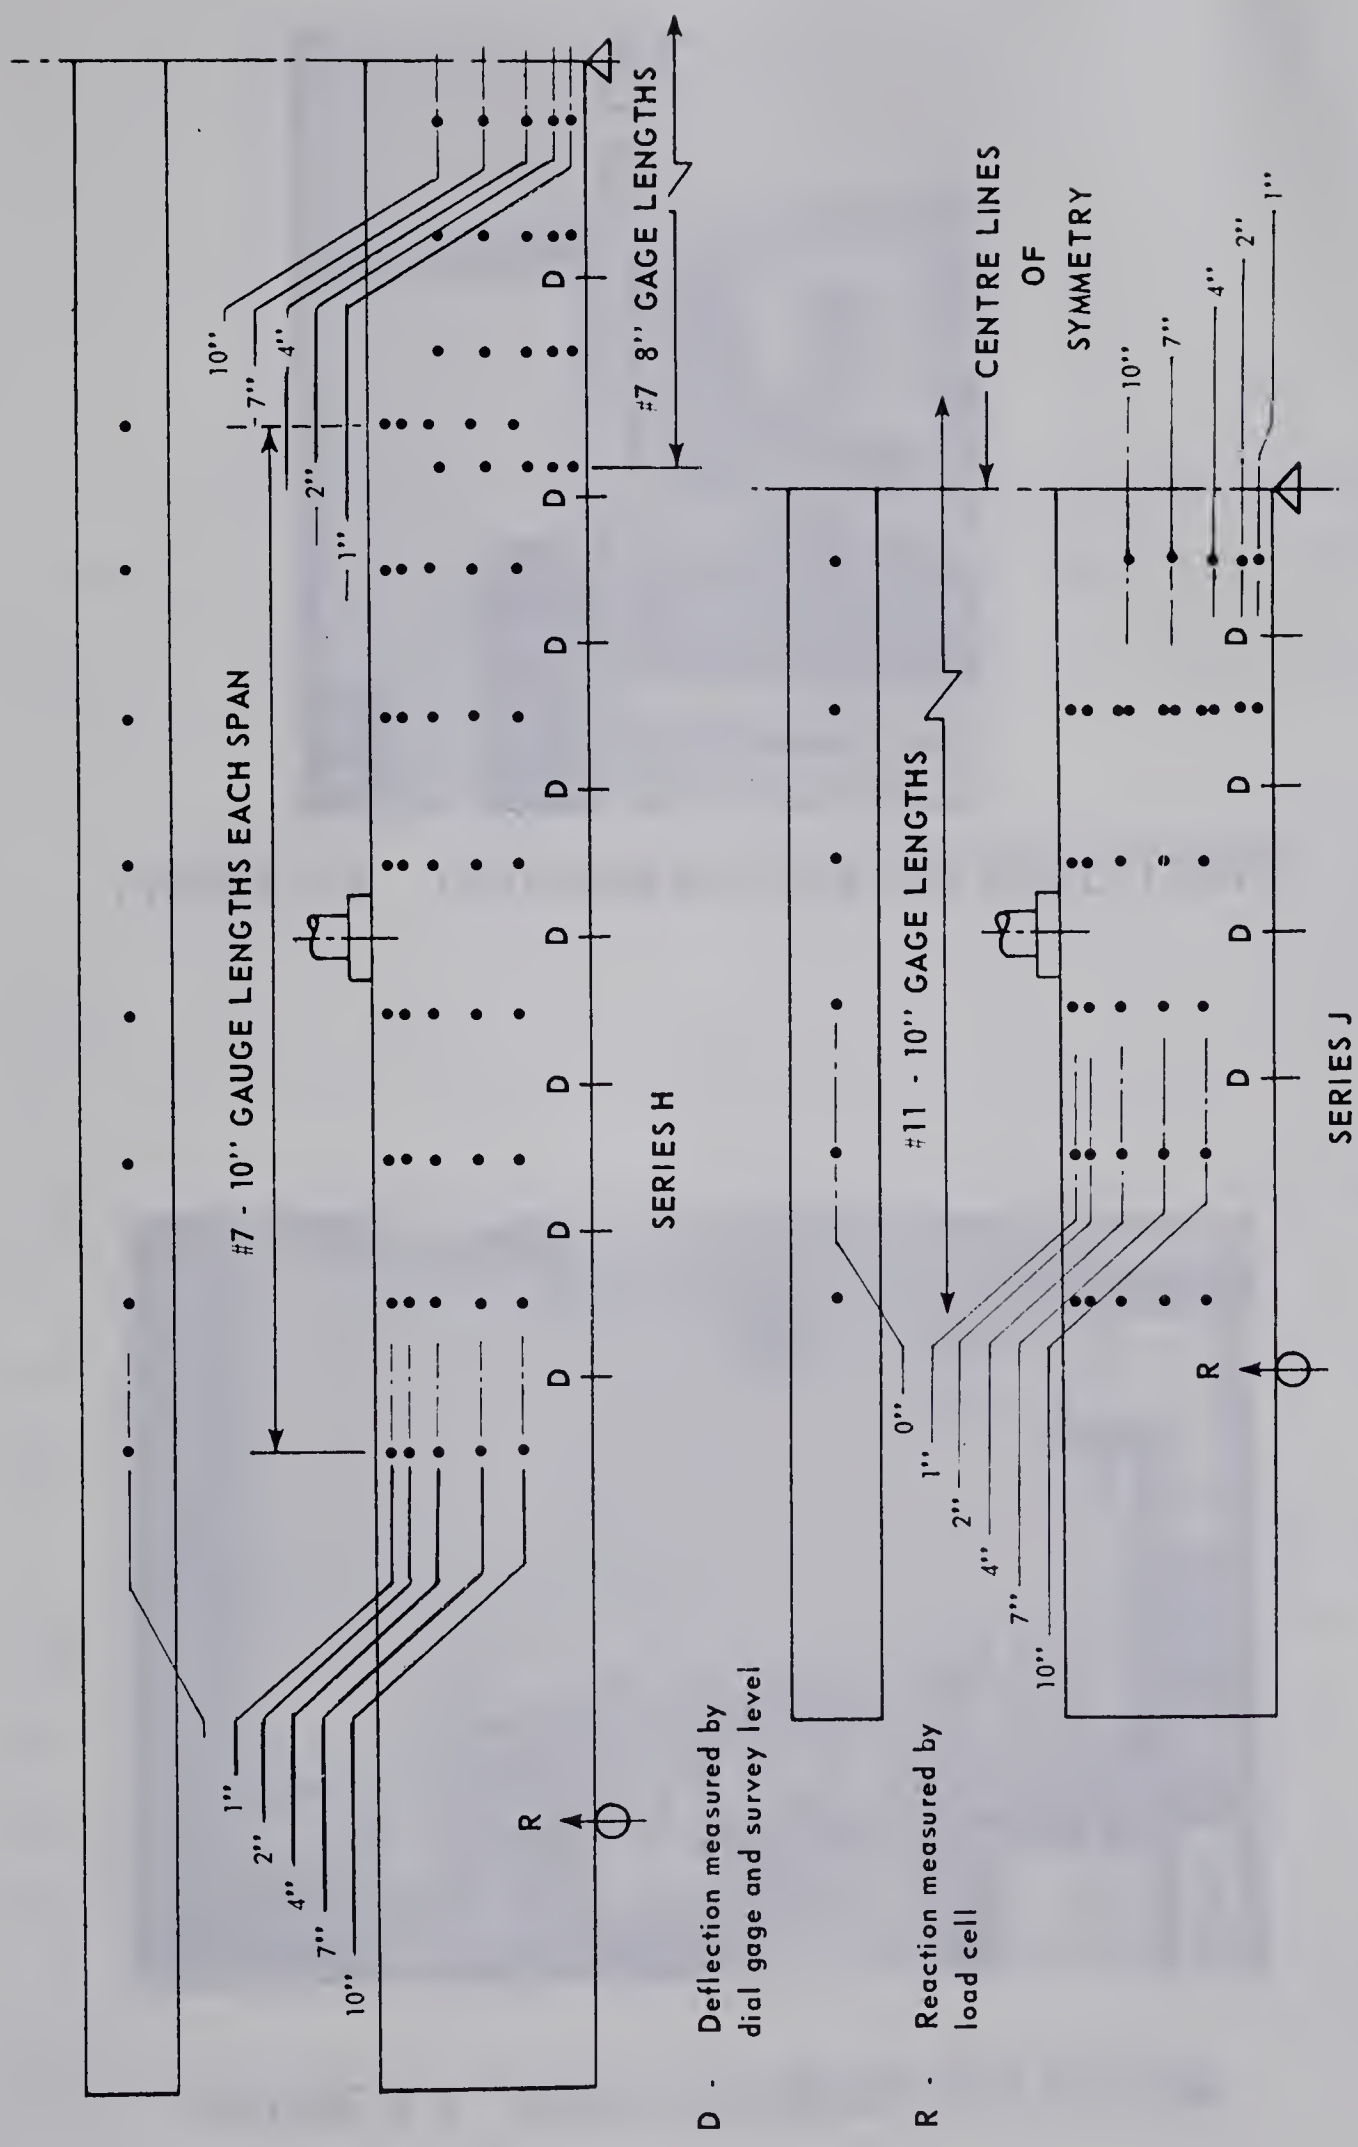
INSTRUMENTATION OF TEST BEAMS
